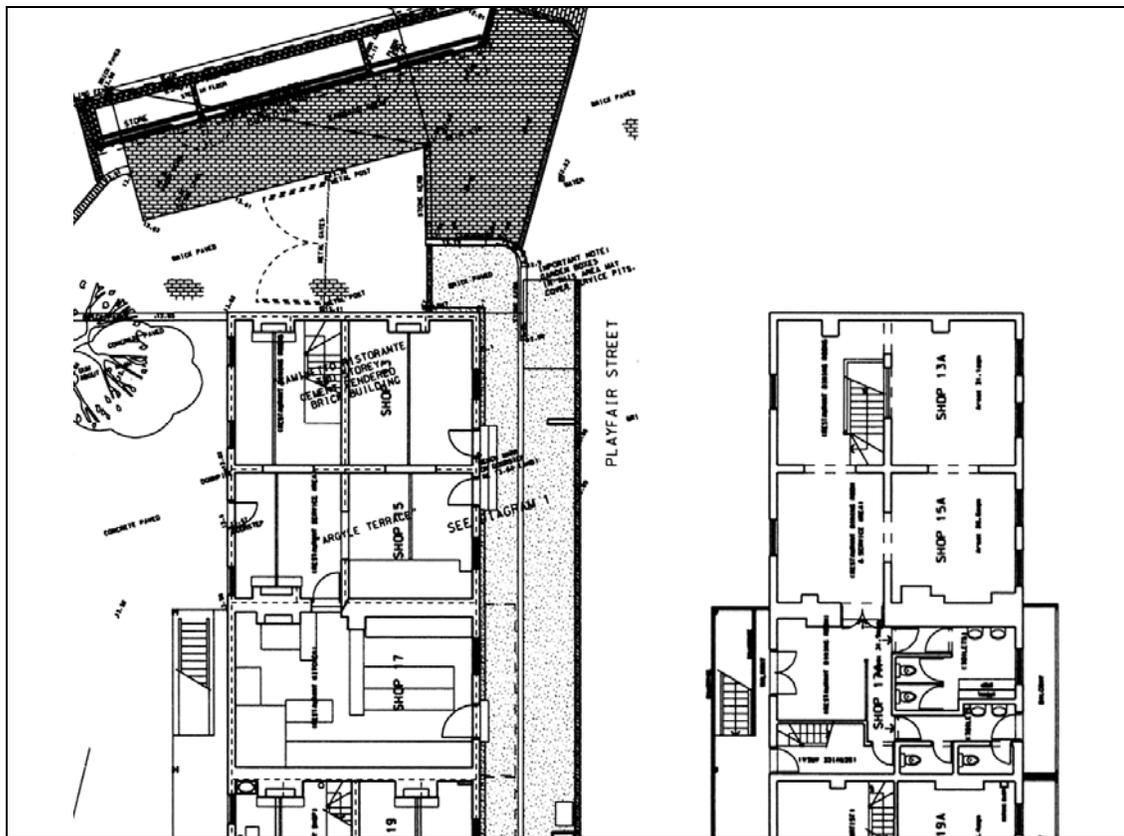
Ground and First Floor Plans Nos. 13-17 Playfair Street (Source: Foreshore Authority, 2003).
